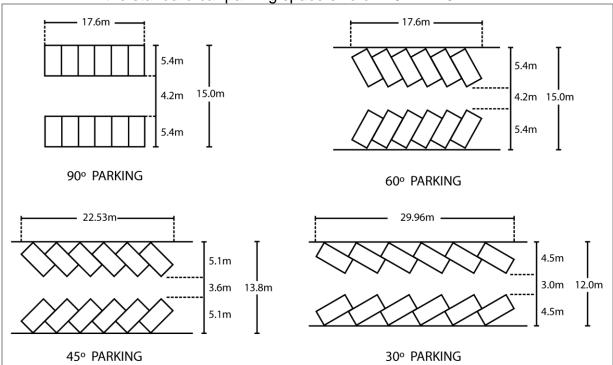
Alternative ways of arranging 12 car parking spaces in accordance to the standard car parking space size of 4.8m x 2.6m
